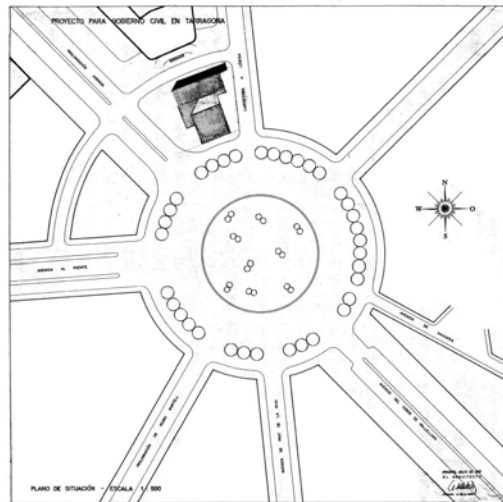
Plan and view. Plaza Imperial Tarraco, Tarragona, c. 1959. Site for the new Civil Government Building on the north side.
